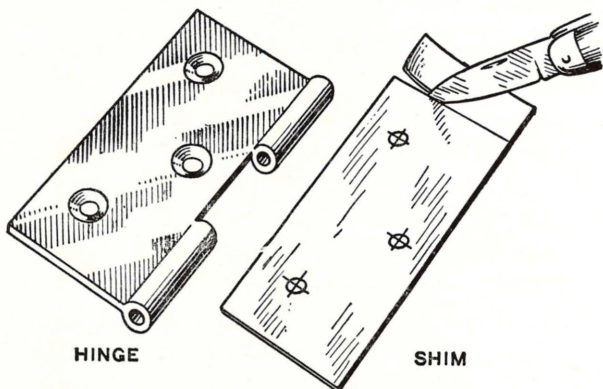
A cardboard shim may be cut with the scissors or a jack knife
